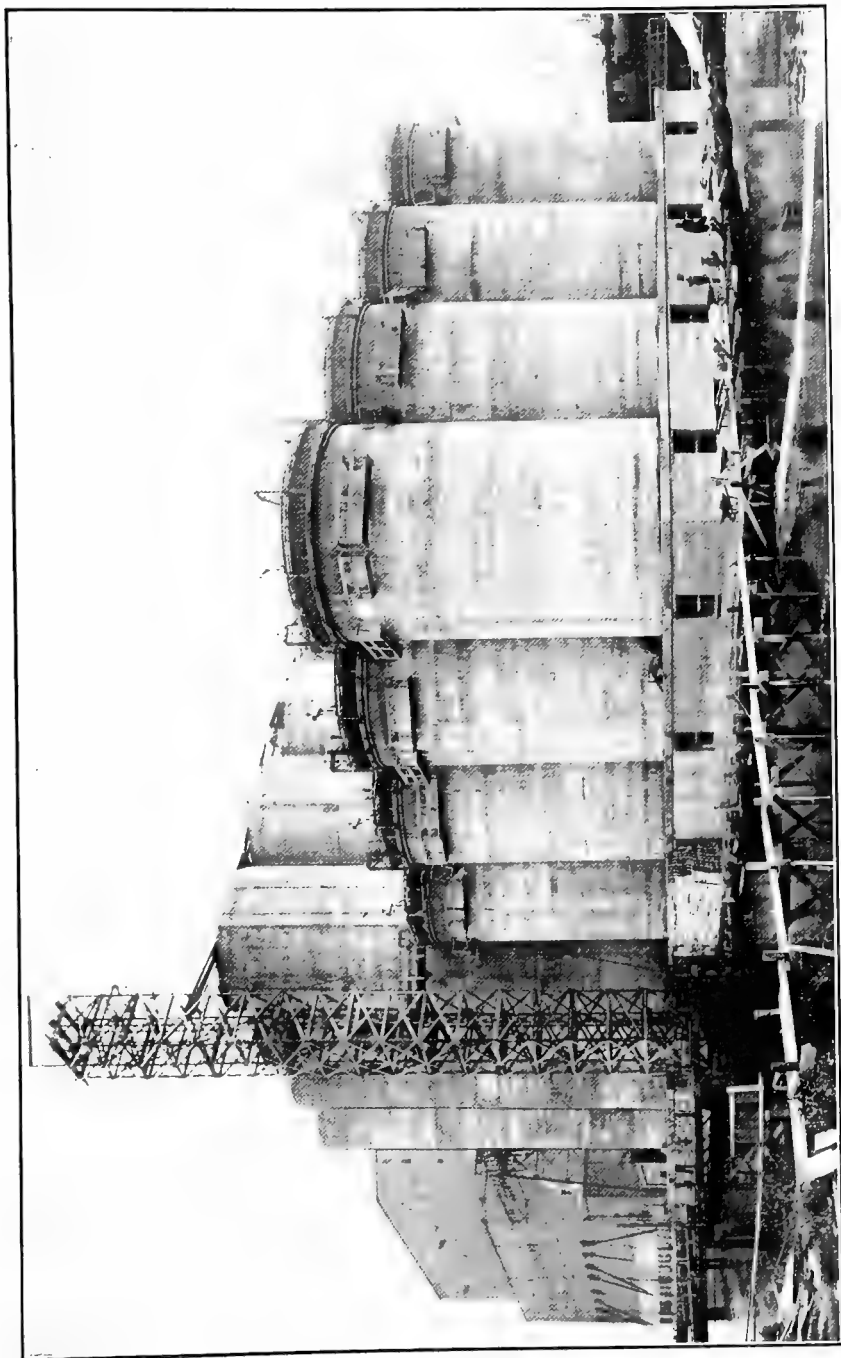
GRAIN ELEVATOR BEING CONSTRUCTED.
